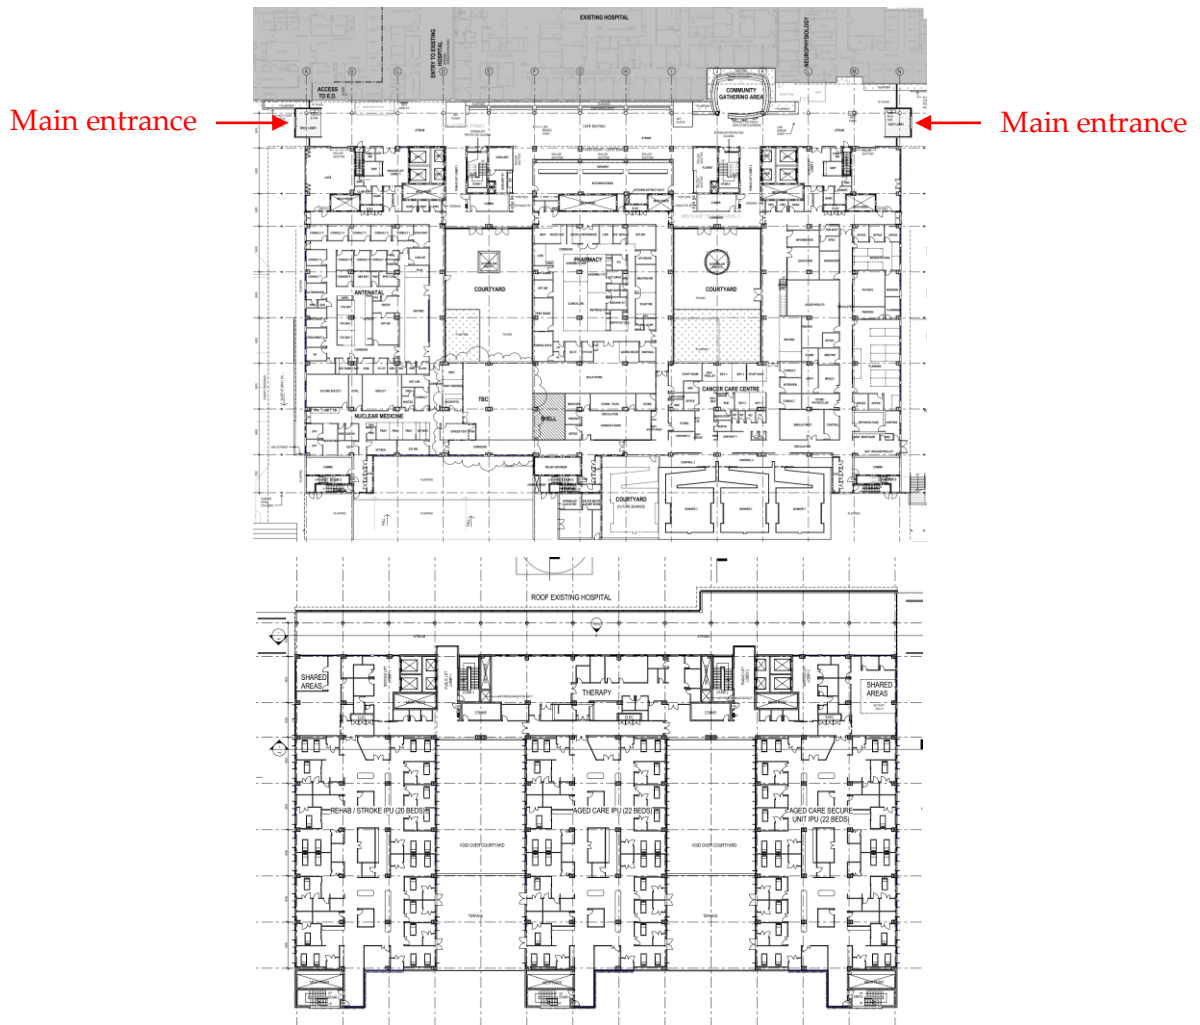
Level 3 and Level 5 floor plans of the proposed development
